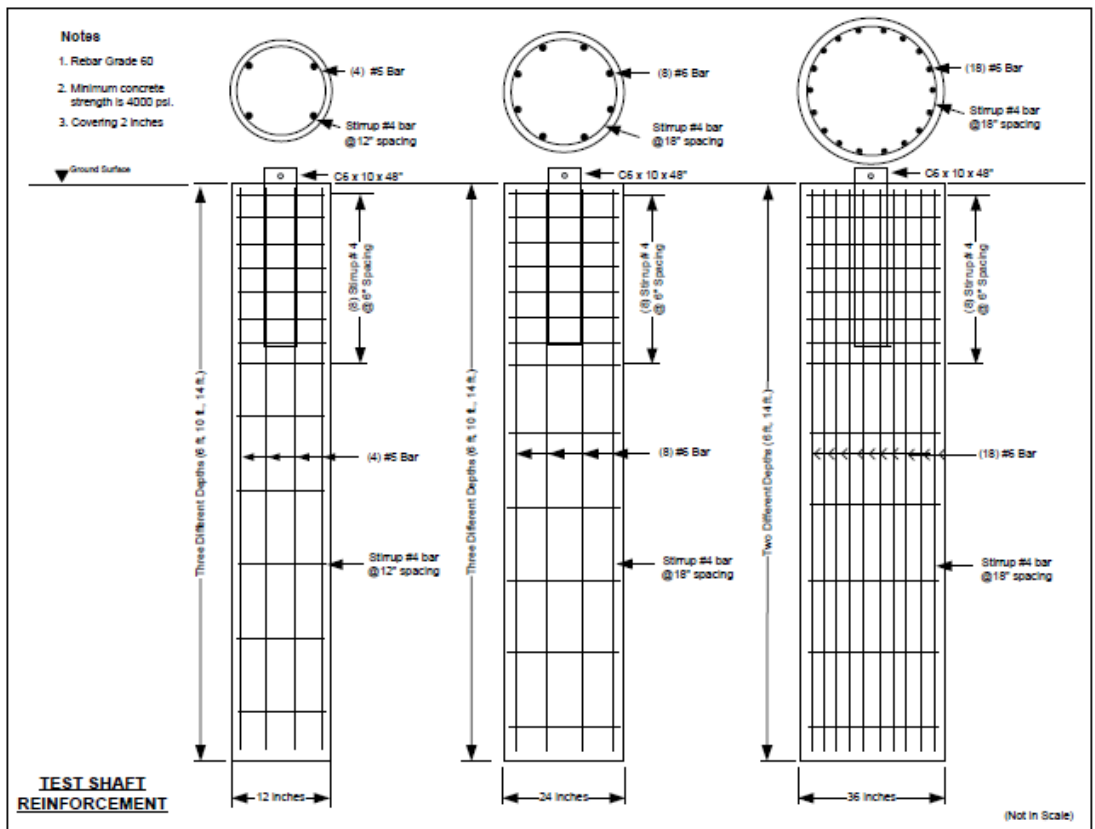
Steel Reinforcement Plan Sheet for the Test Shafts
